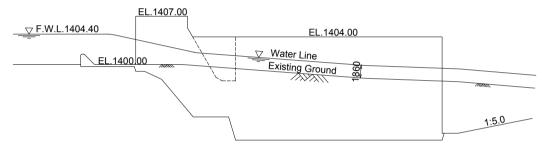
Water Line on Powerhouse Wall beside River Side
